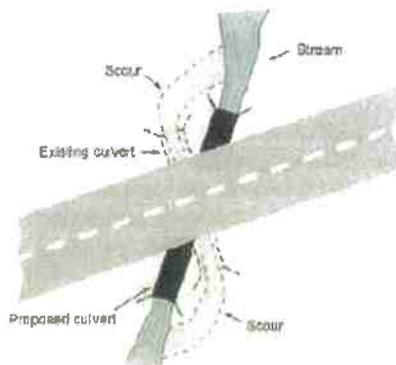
Culvert alignment should be in relation to the stream and not the road. It is important that the stream enters and leaves the culvert in a relatively straight horizontal alignment so streamflow does not have to turn to enter the inlet or discharge into a bank as it exits. This figure shows a redesigned culvert installation that replaces the bending alignment that previously existed. Channel turns at the inlet increase plugging potential because wood going through the turn will not align with the inlet. Similarly, channel turns at the inlet and outlet are often accompanied by scour against the channel banks (Wisconsin Transportation Information Center, 2004).
